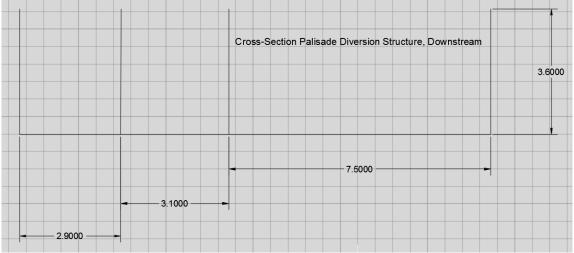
Cross-section Palisade diversion structure, downstream (ft)
